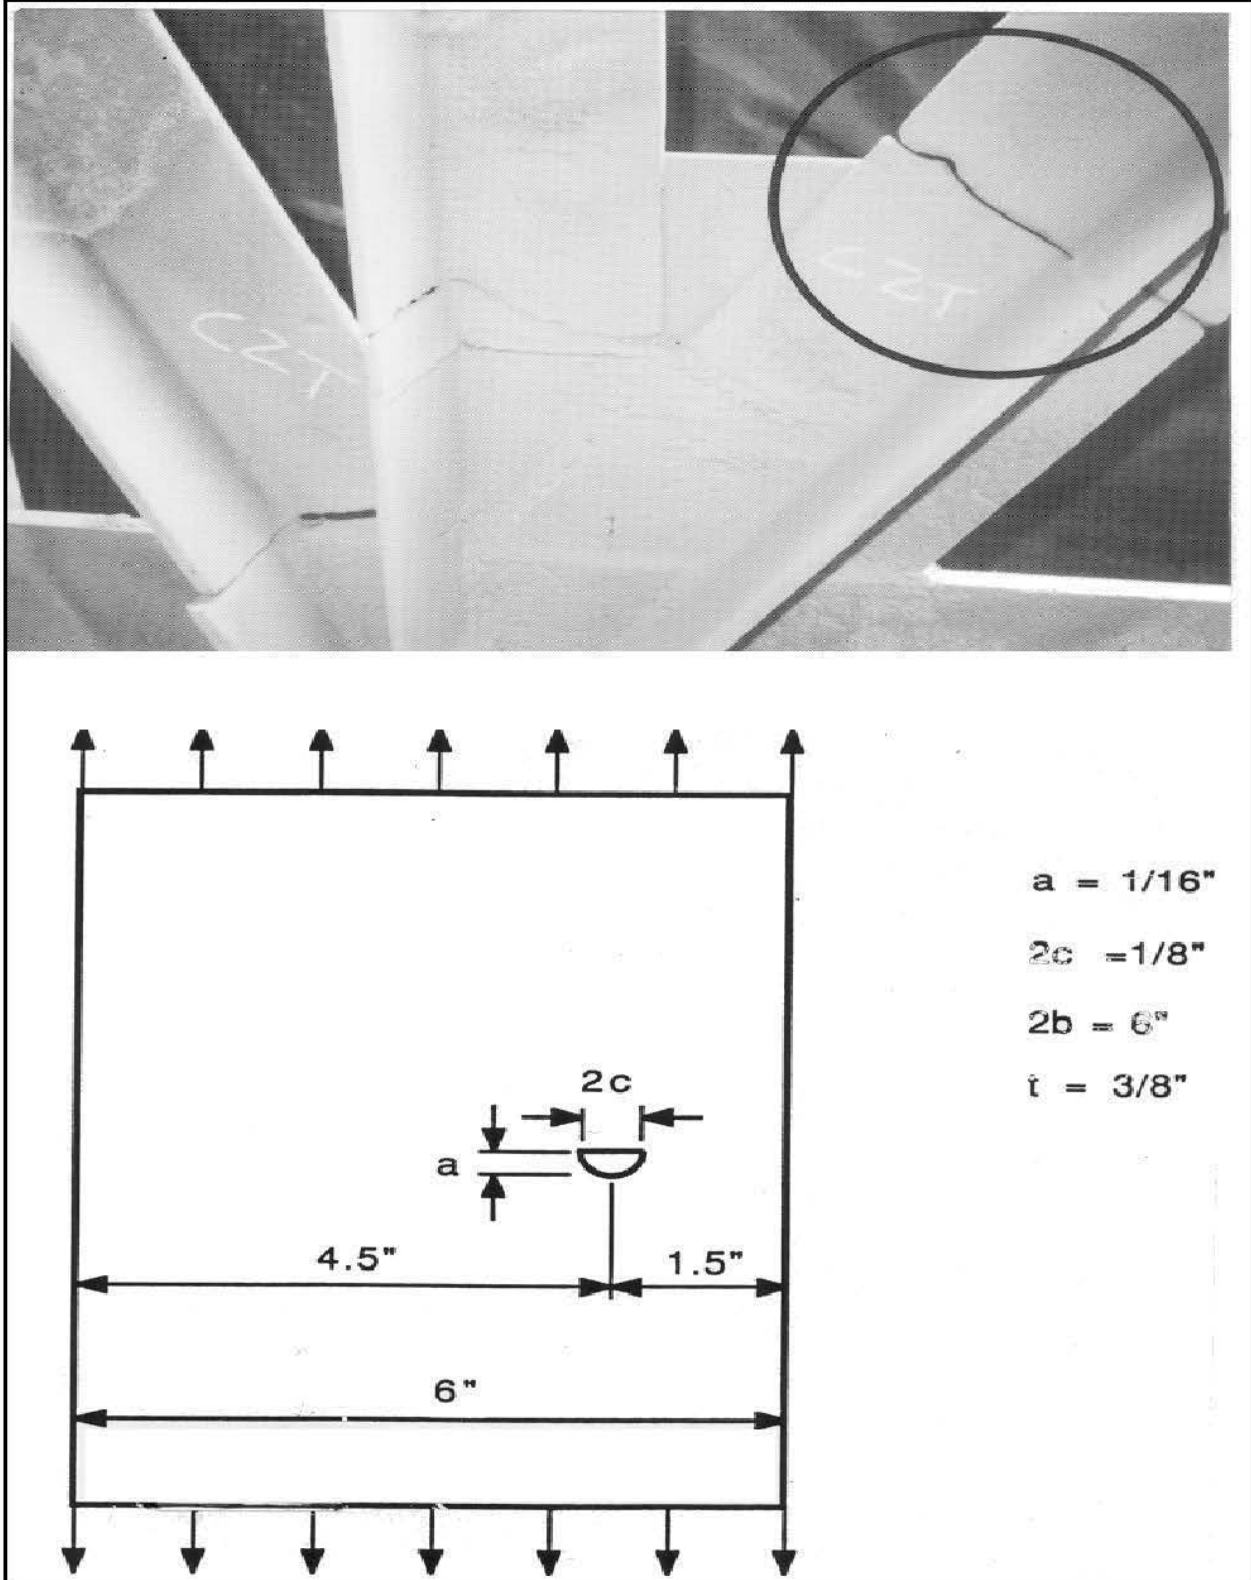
A stiffening member with a crack (1 in. = 2.54 cm)
